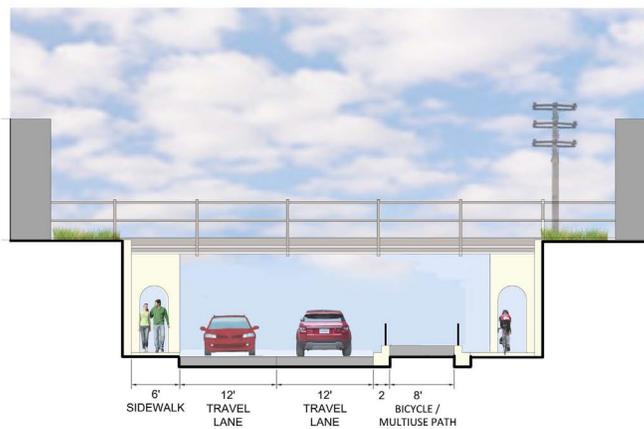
1st Street Underpass (8th Avenue to 7th Avenue)
